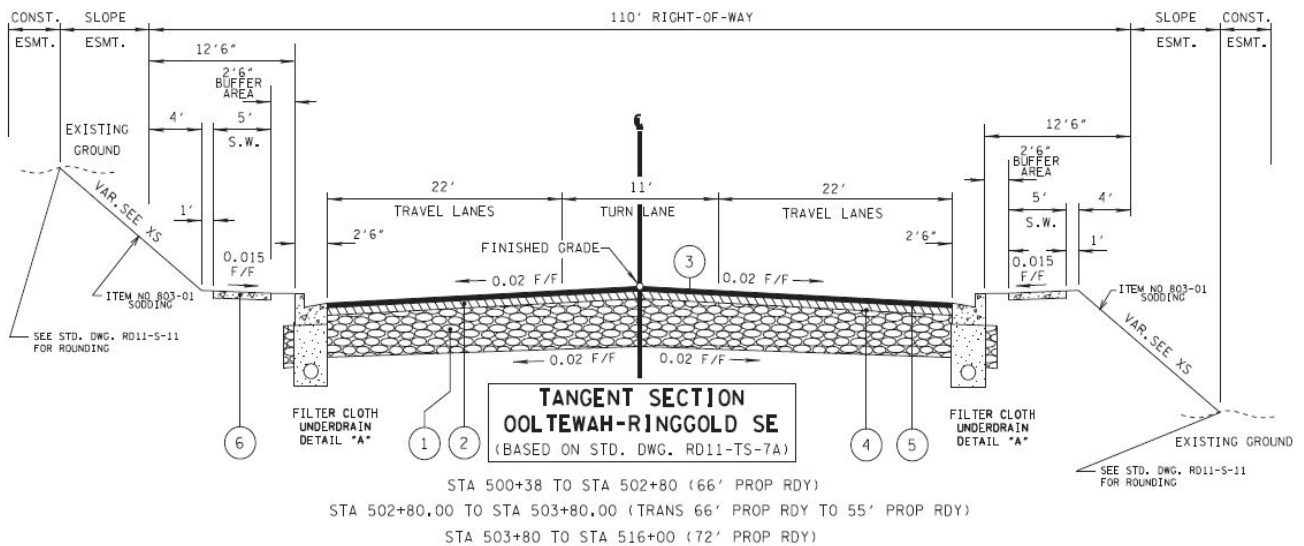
Typical Section of SR-321 south of the intersection with SR-320
